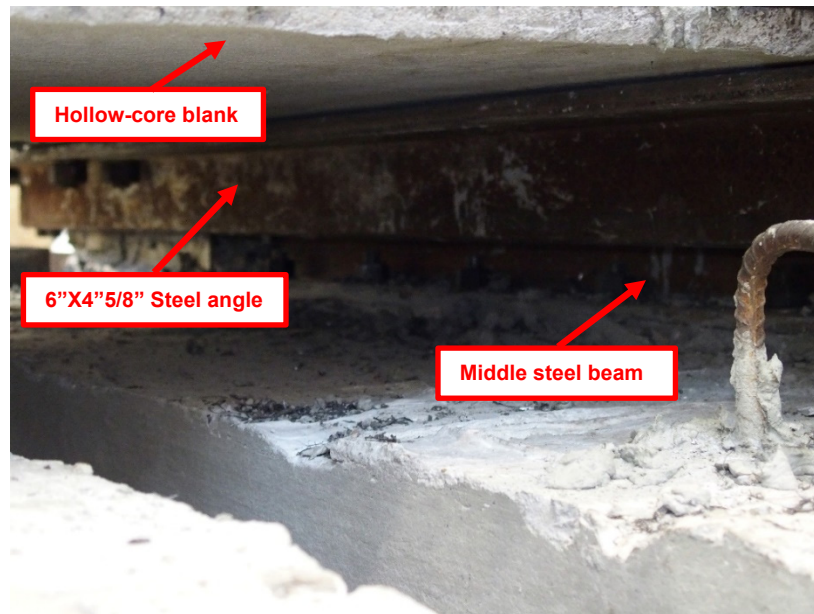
The 6"X4"X5/8" steel angle underneath the hollow-core panels.
